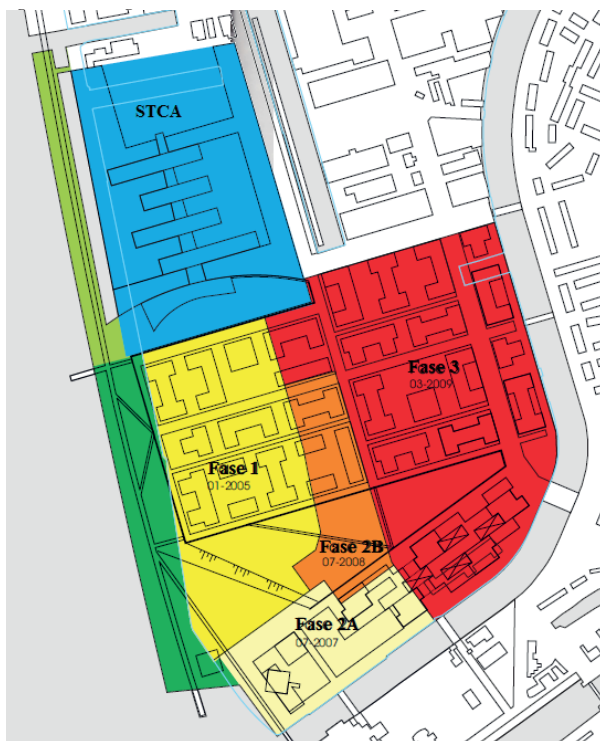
Plan Overhoeks with phasing (Atelier Shell, 2004)
